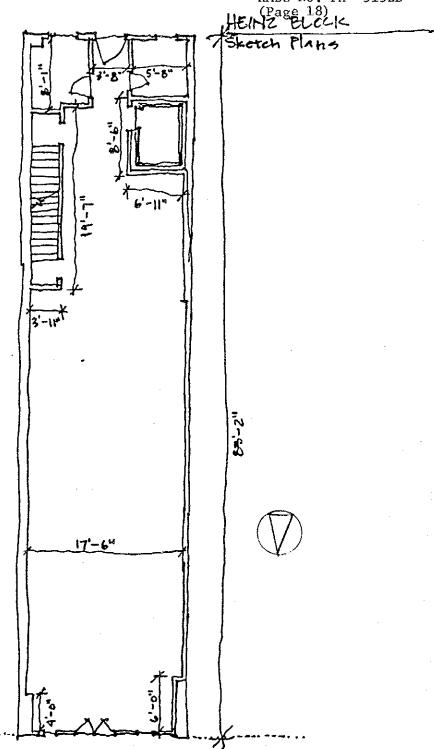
Sketch plan of First Floor of 639 Liberty Avenue, by John Bertola and Philip Snyder, of Kingsland, Bauer, Havekotte, Pittsburgh, PA.
